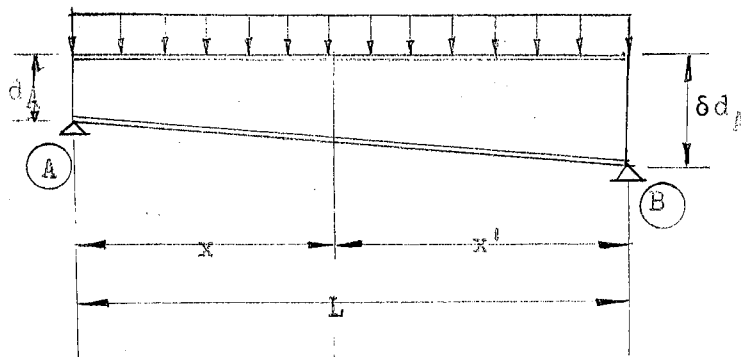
A Tapered Beam of I-Section, Box Section of T-Section
